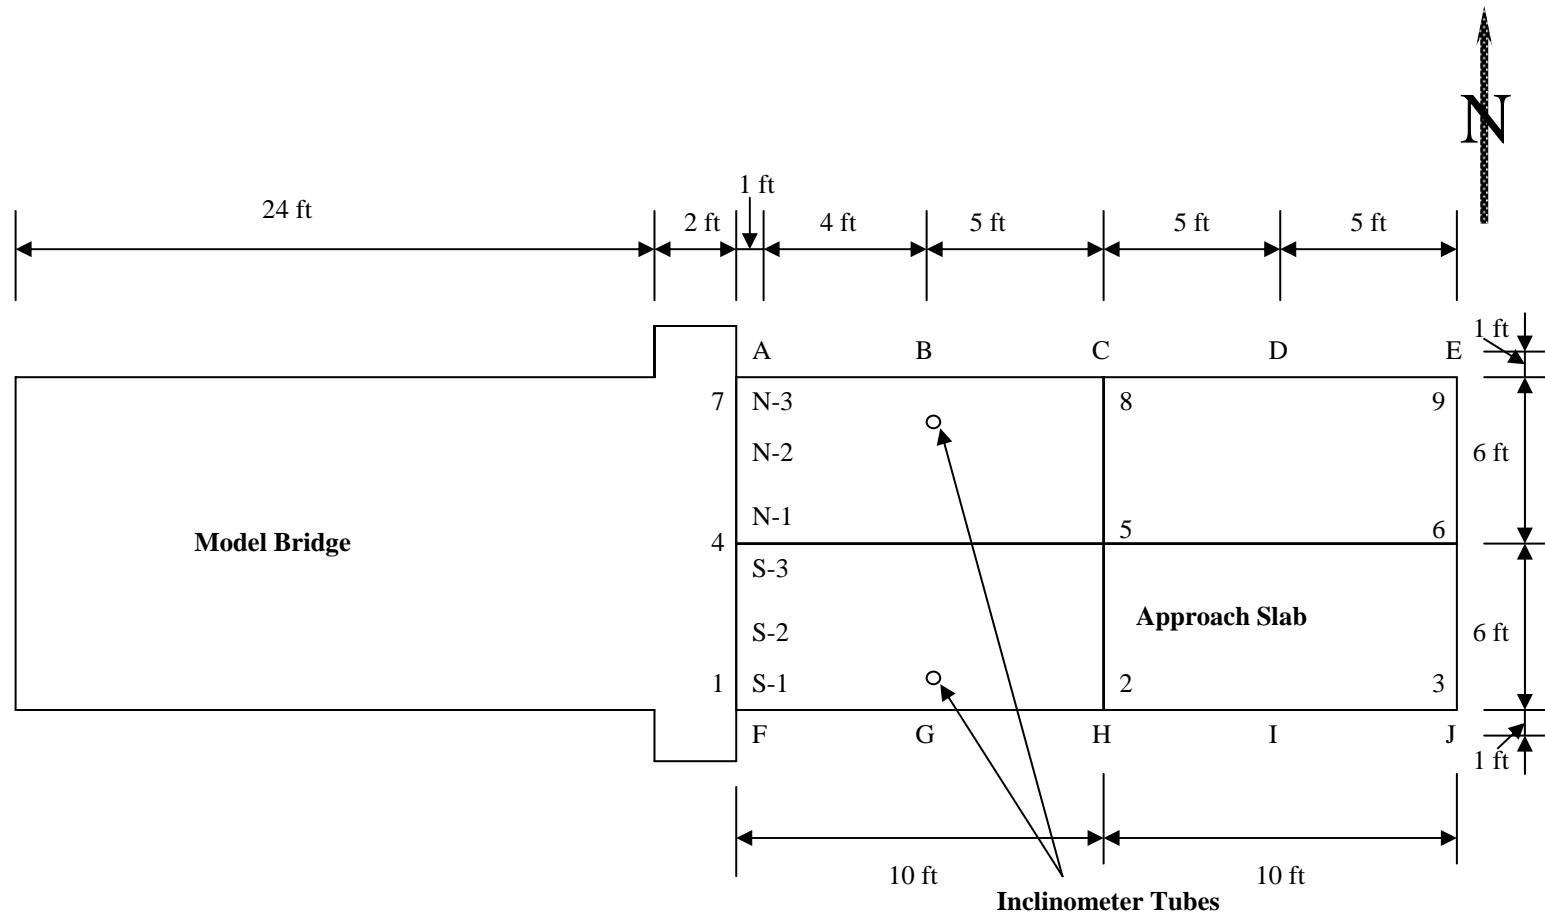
Instrumentation for monitoring the backfill, embankments, abutment, and approach slab. (Void development was measured through holes S-1, N-1, etc. Approach slab elevations were recorded from stations 1, 2, 3, etc. Embankment elevations were recorded on elevation stakes A, B, C, etc.)
